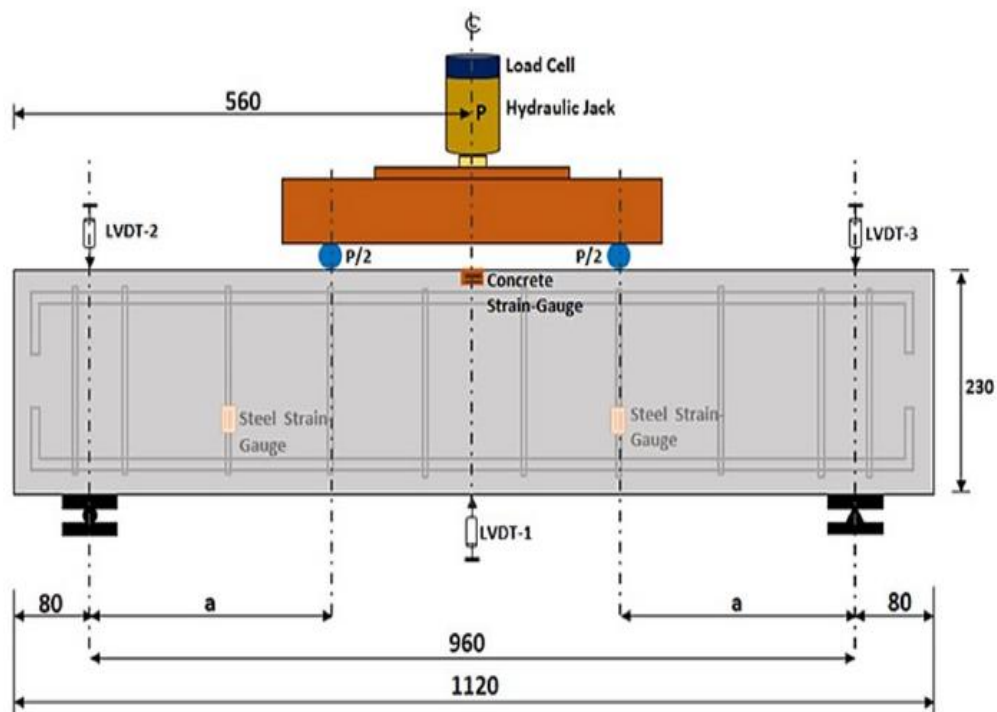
Schematic representation of beam testing setup (all dimensions in mm).
